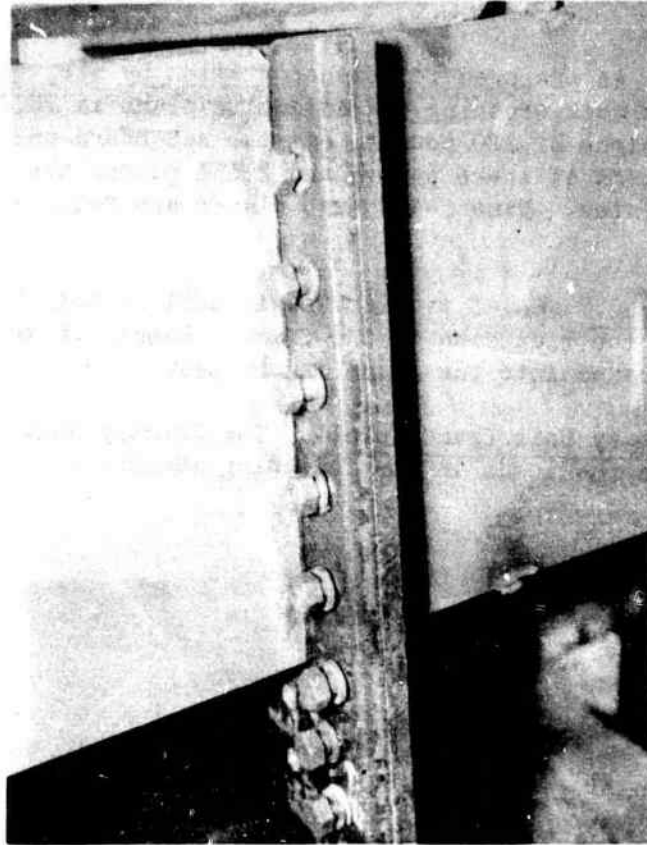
BUTT-PLATES INSTALLED (PRIMARY UNIT)
